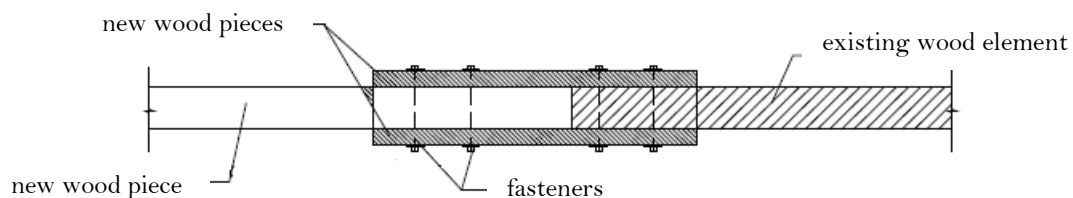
Replacement of a degraded part of a wood beam with new wood parts (top view) (Dias, 2008)
